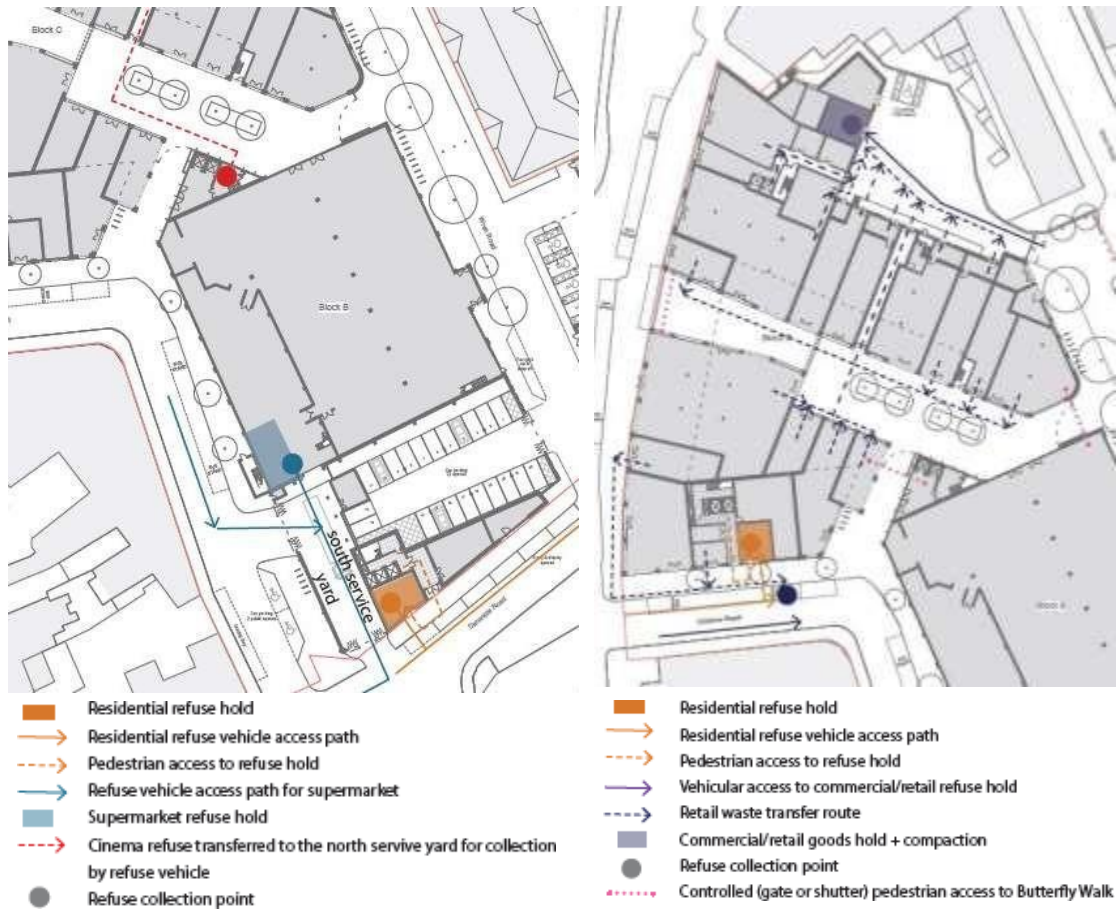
(above left): Block B refuse strategy. Figure 58 (above right): Block C refuse strategy.
